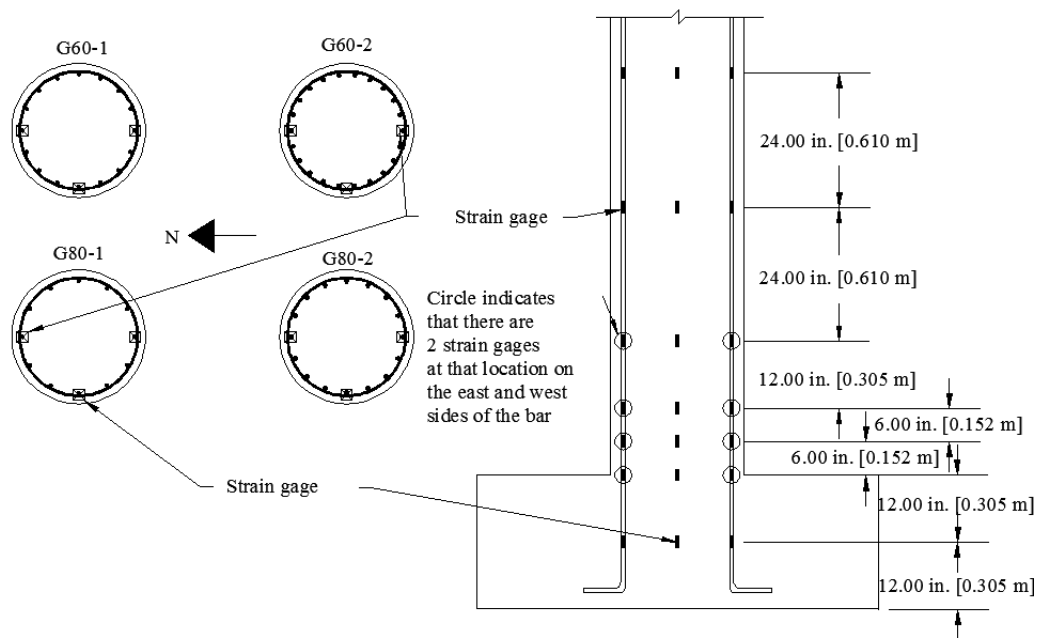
Columns G60-1, G80-1, G60-2 and G80-2 internal instrumentation
